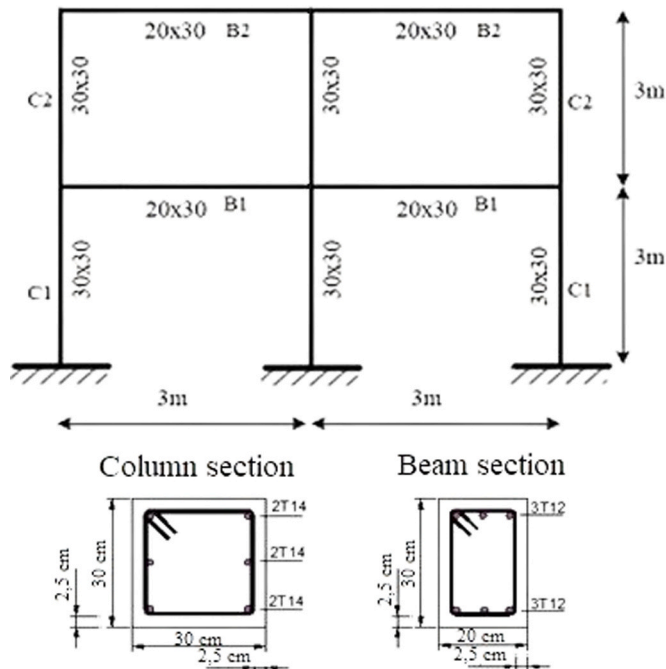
Geometry and reinforcement cross-sections of the frame.
